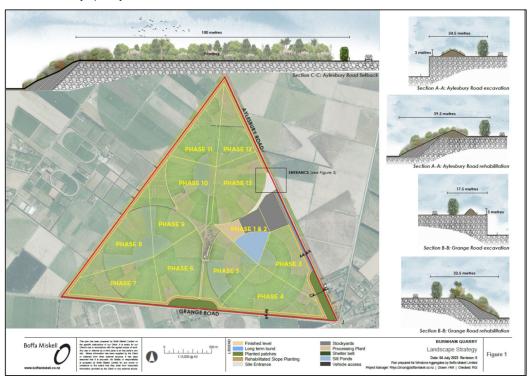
Proposed Site layout (Source: Boffa Miskell)
